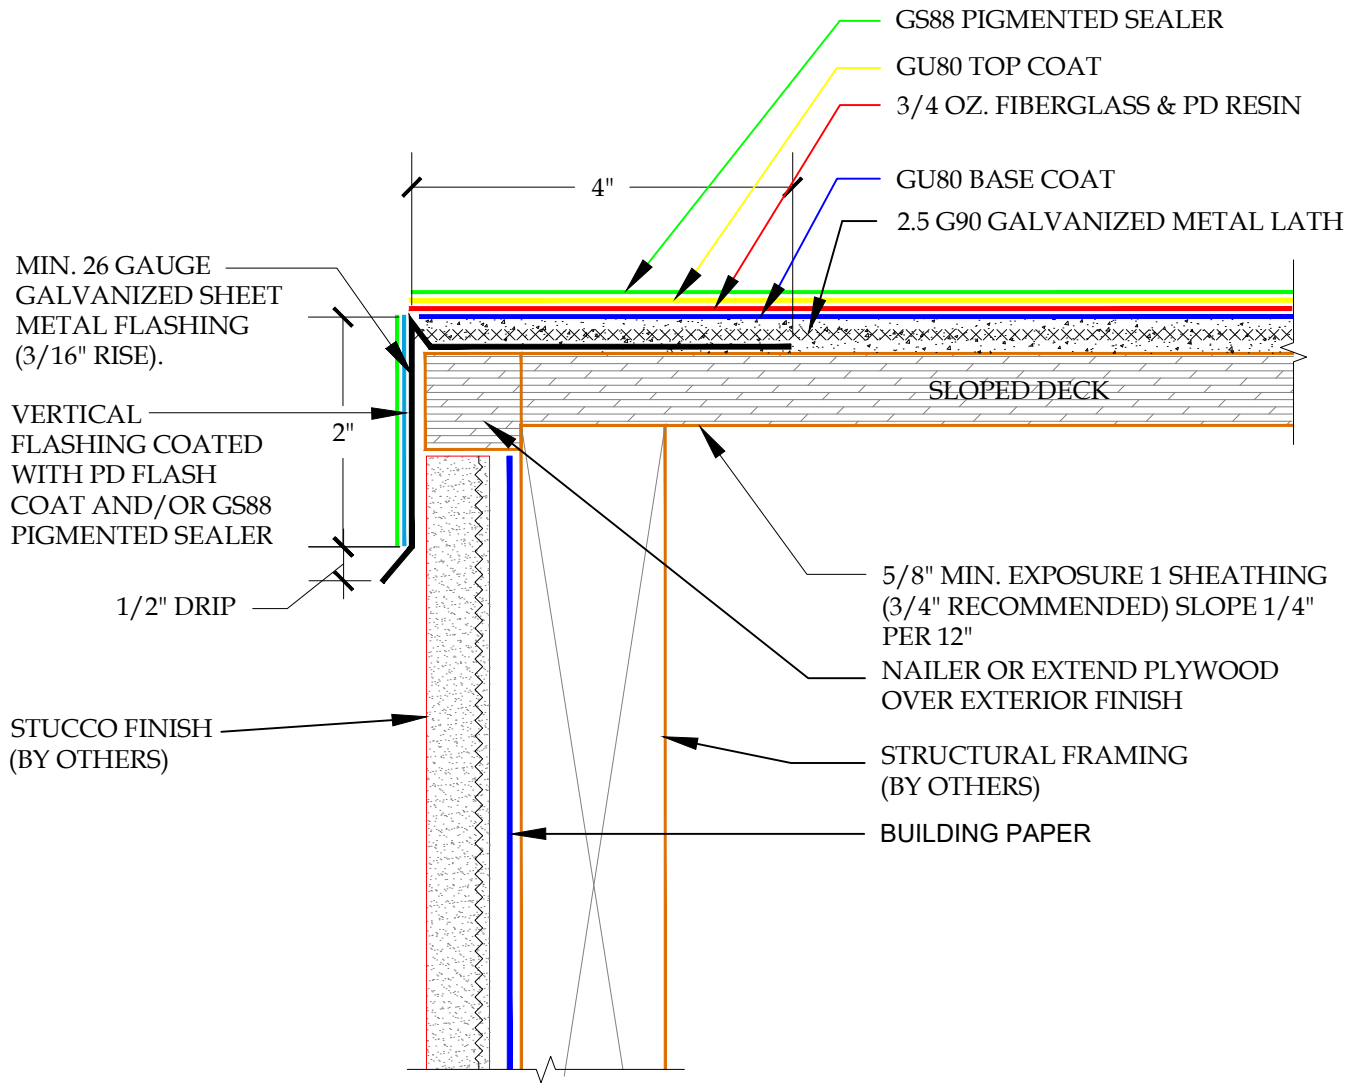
DETAIL-DECK TO WALL FLASHING DETAIL-INCLEMENT WEATHER
